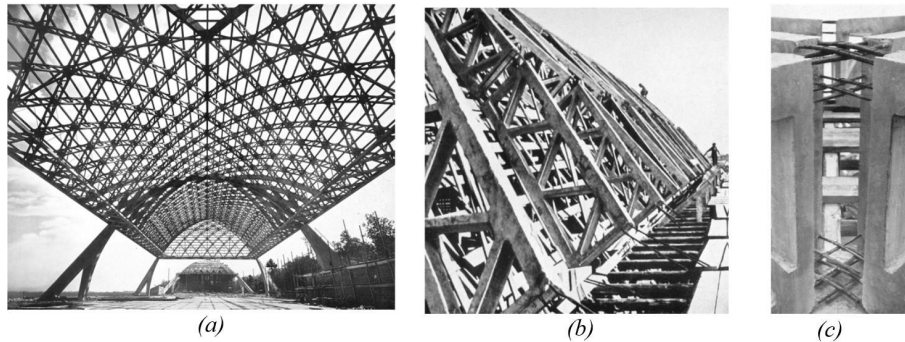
Pre-fabricated Airforce hangars, Pier Luigi Nervi, Orvieto, 1939: (a) interior view of the lattice shell before the planking; (b) prefabricated truss girders during assembly; (c) detail of the joint before casting.
